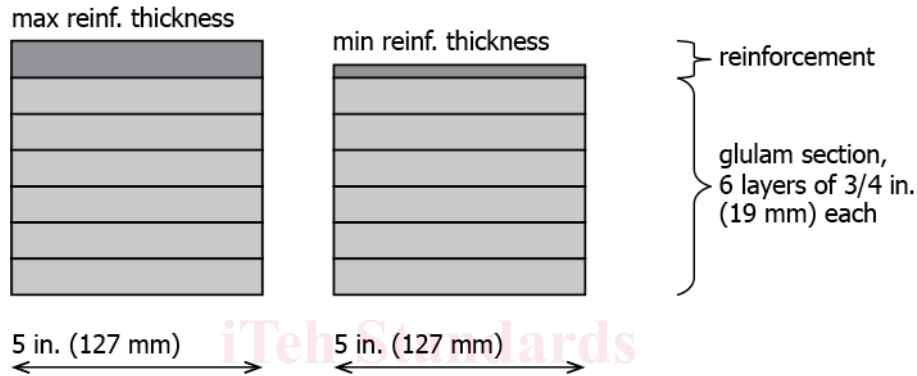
Delamination Specimens for Modified Specification D2559 Test
